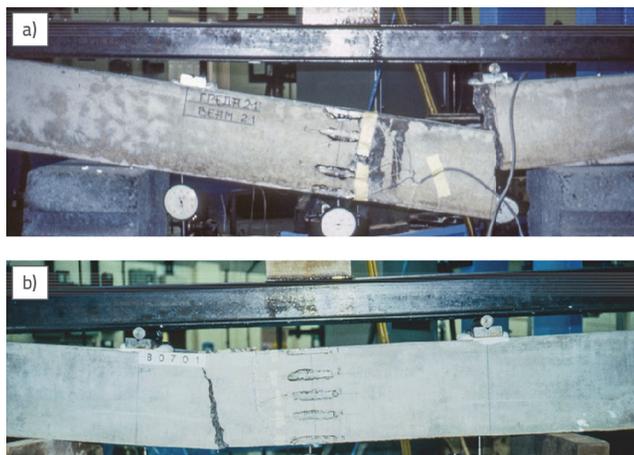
Failure mode of: a) B-PC beams; b) B-SF beams
